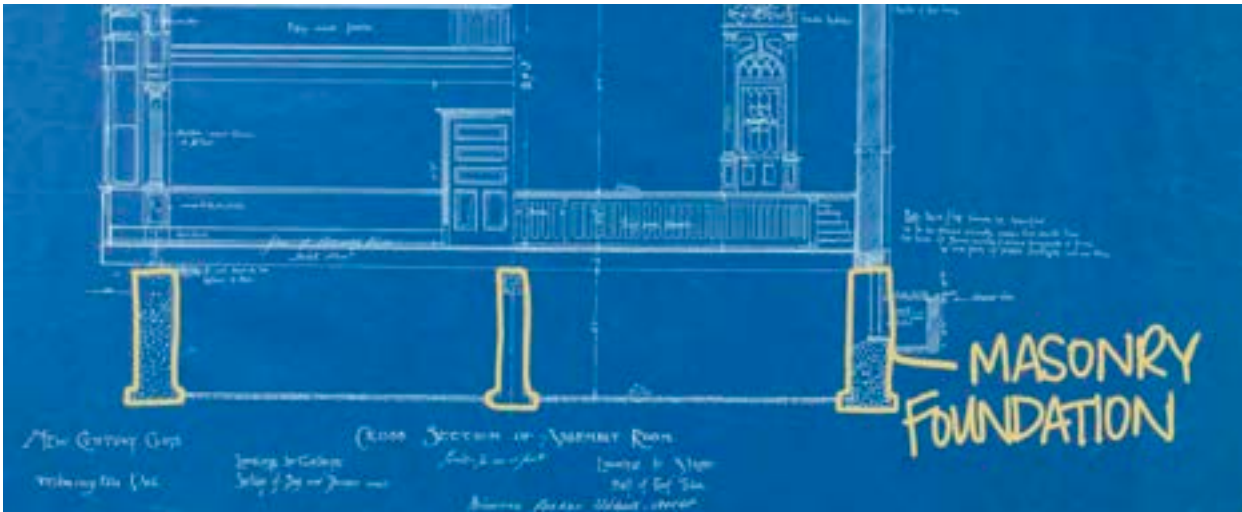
Rubble stone masonry supporting the brick masonry on (1892 Section blueprints)
